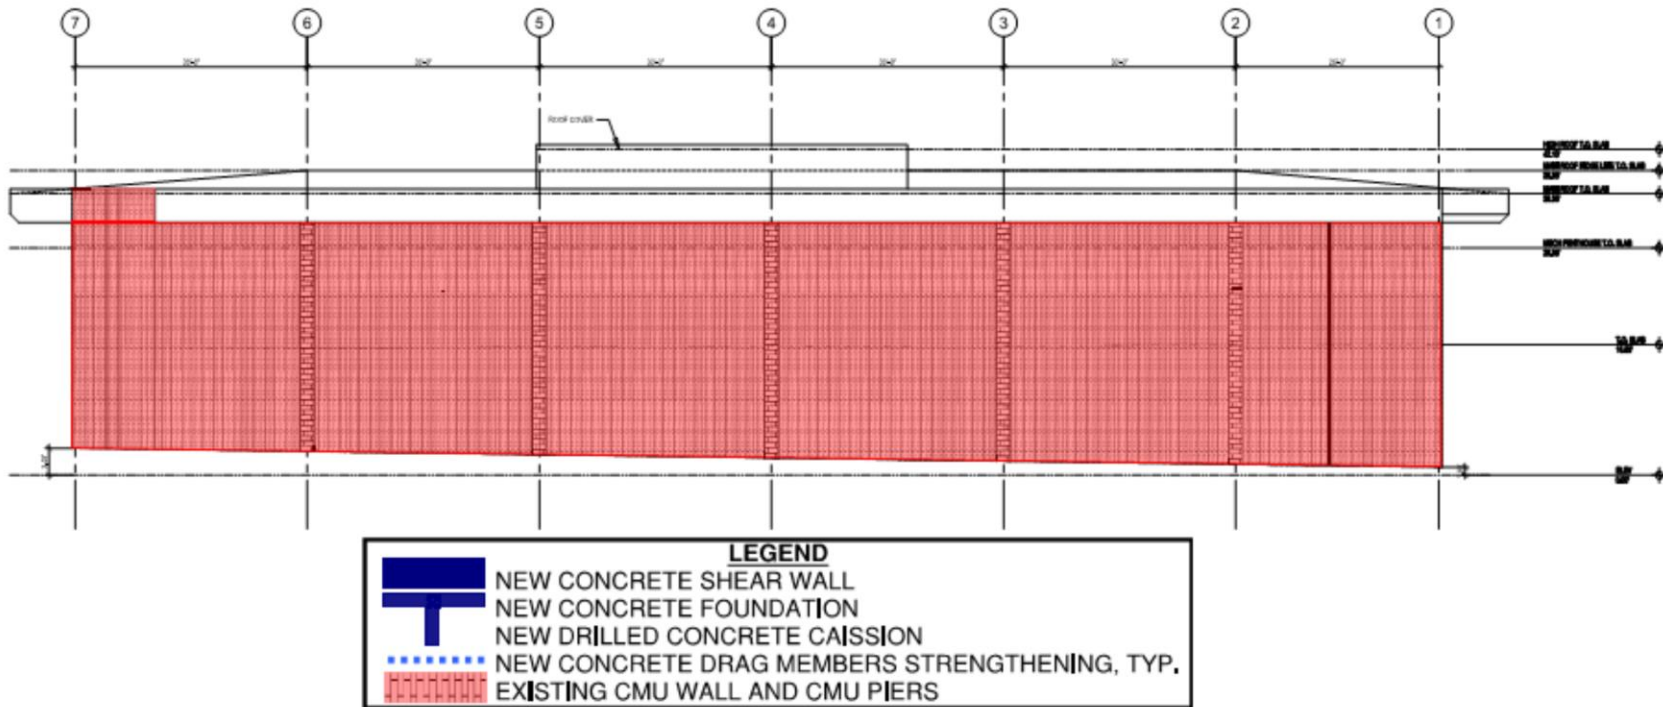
Option No. 2 – South Elevation - No Strengthening
